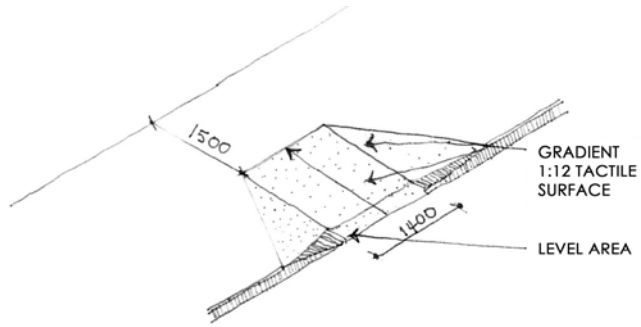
KERB RAMP – WIDE ACCESS ROUTE
